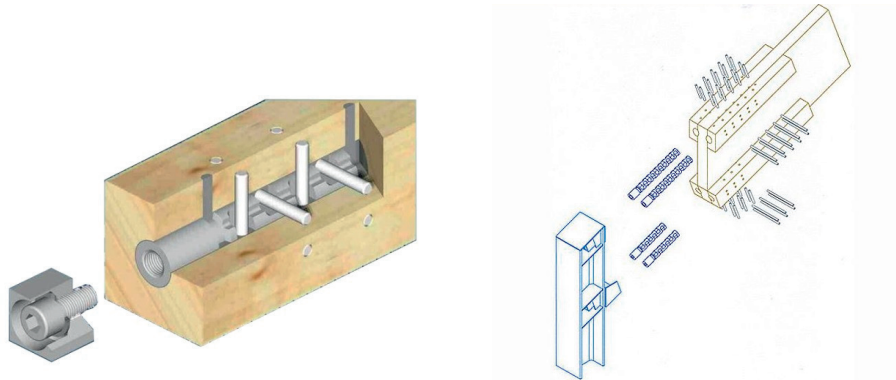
BVD anchor bolt connection – an example of use in a hybrid steel-timber joint [52]
